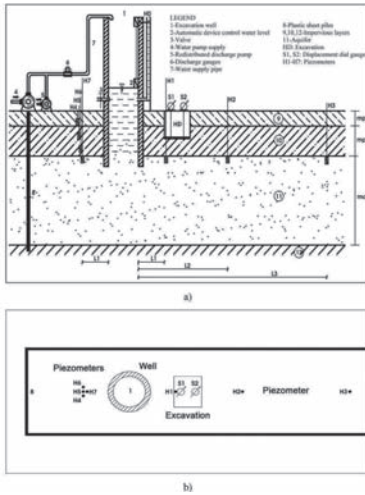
Schematization of field test, (a) cross section, (b) layout, adapted from Bui (2009).
